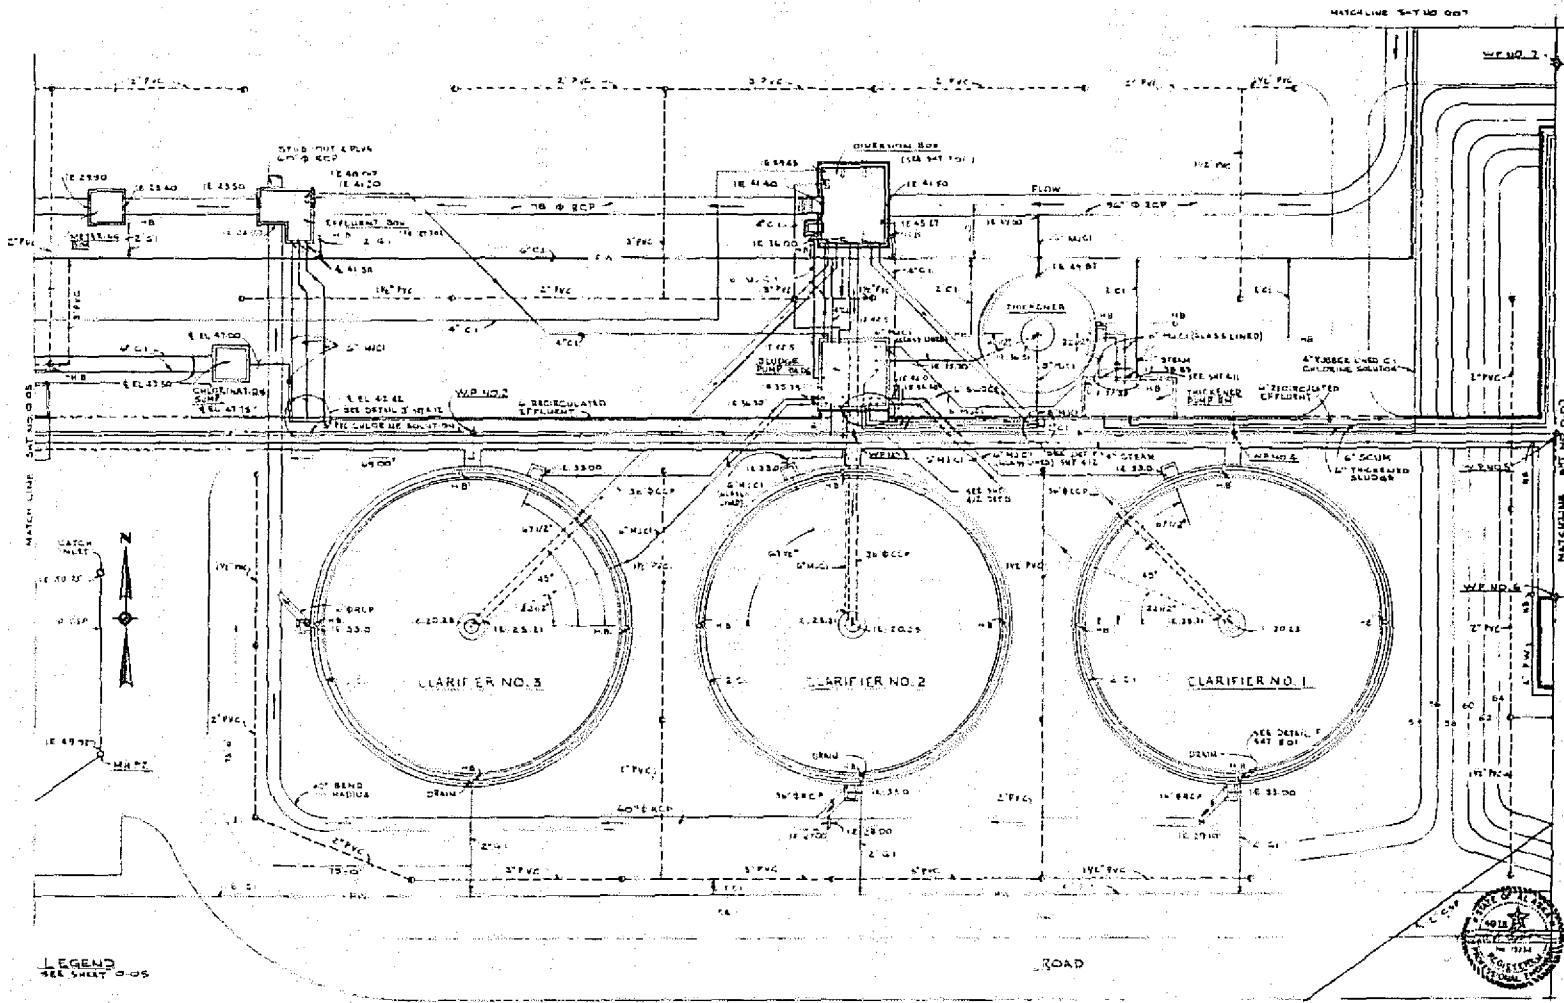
GREATER ANCHORAGE BOROUGH SEWAGE PROJECT. (Borough Engineers, 1970)
